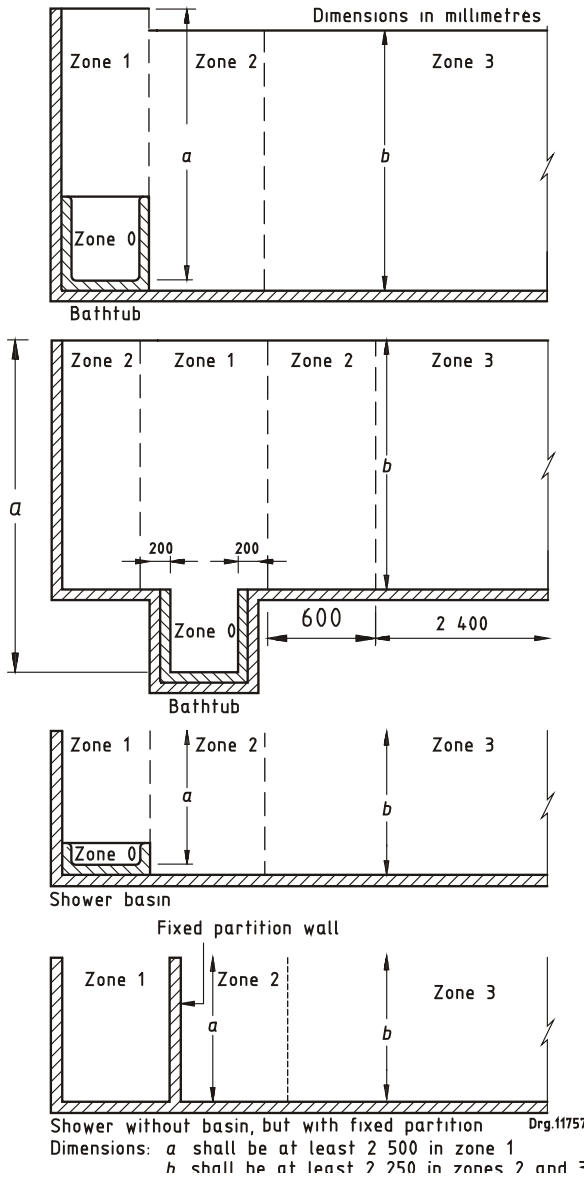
Elevation of zone dimensions for bathrooms
